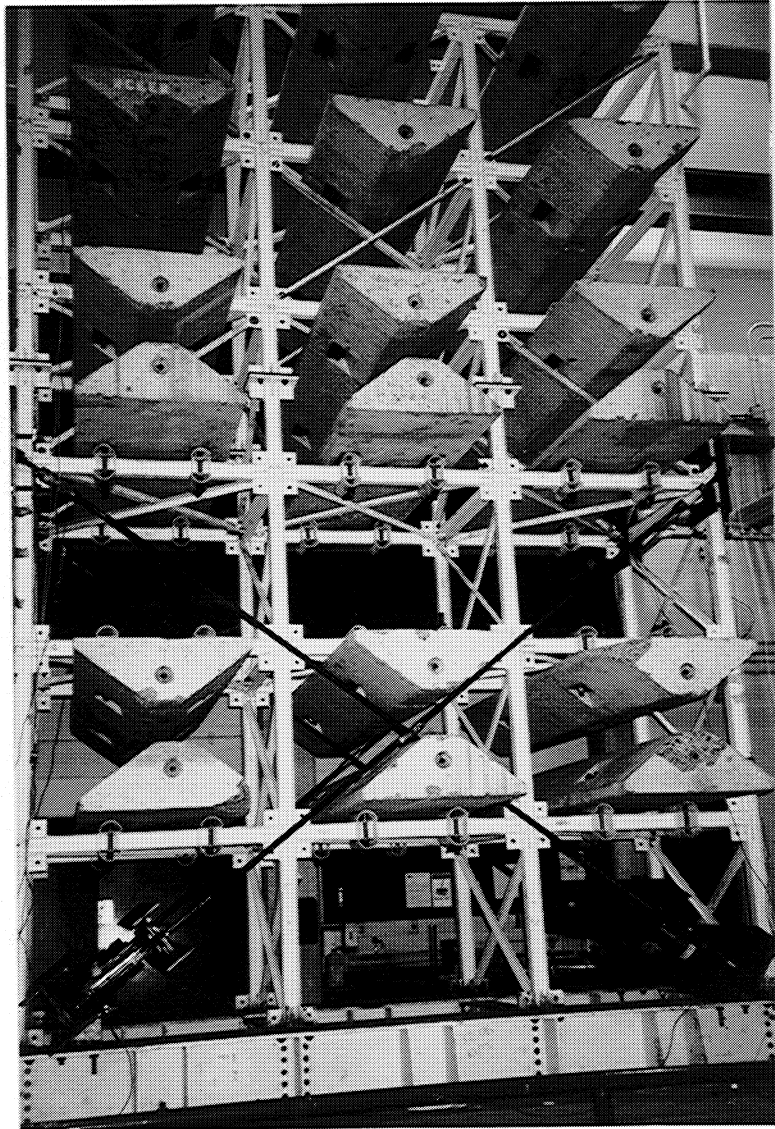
Photograph of the $\frac{1}{4}$ Scale Model Test Structure: Rigid foundations (I-beams) were fixed to the shaking table platform and, the test structure with the supplementary system were placed on these foundation beams.
